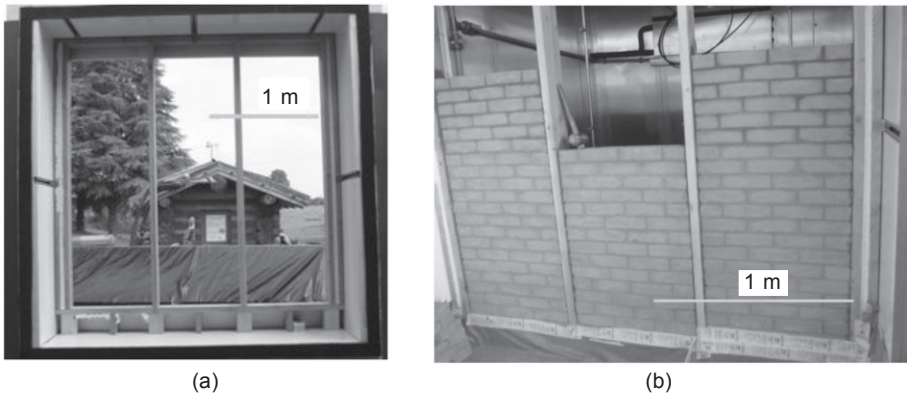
(a) Wood wall framing in carriage; (b) building wall placed in the double wall.
